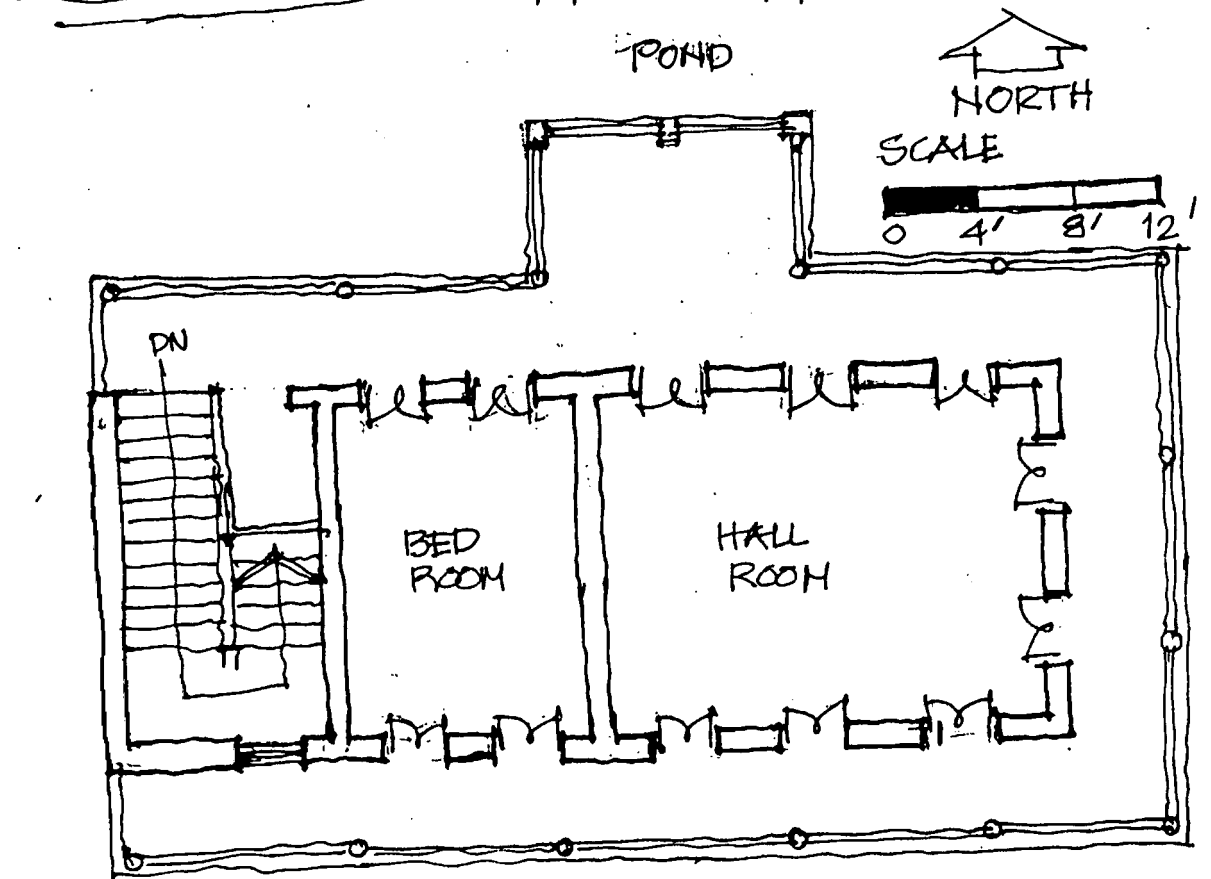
First floor plan, Prem Kanan, Khulna
